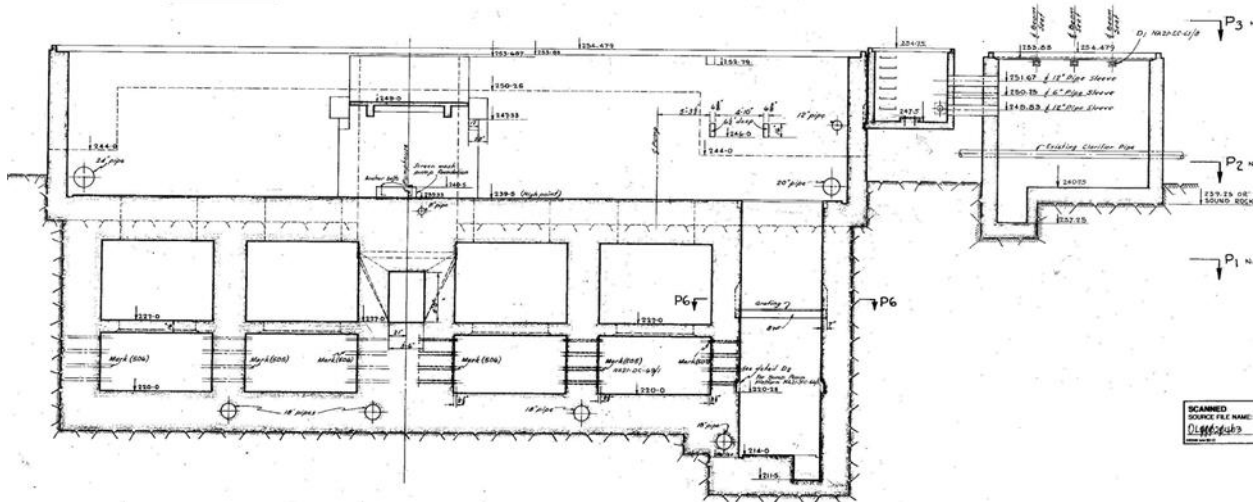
Elevation view of Pumphouse 1 (Units 1 and 2) from historical drawing (NA21-EC-61-5 CW)
